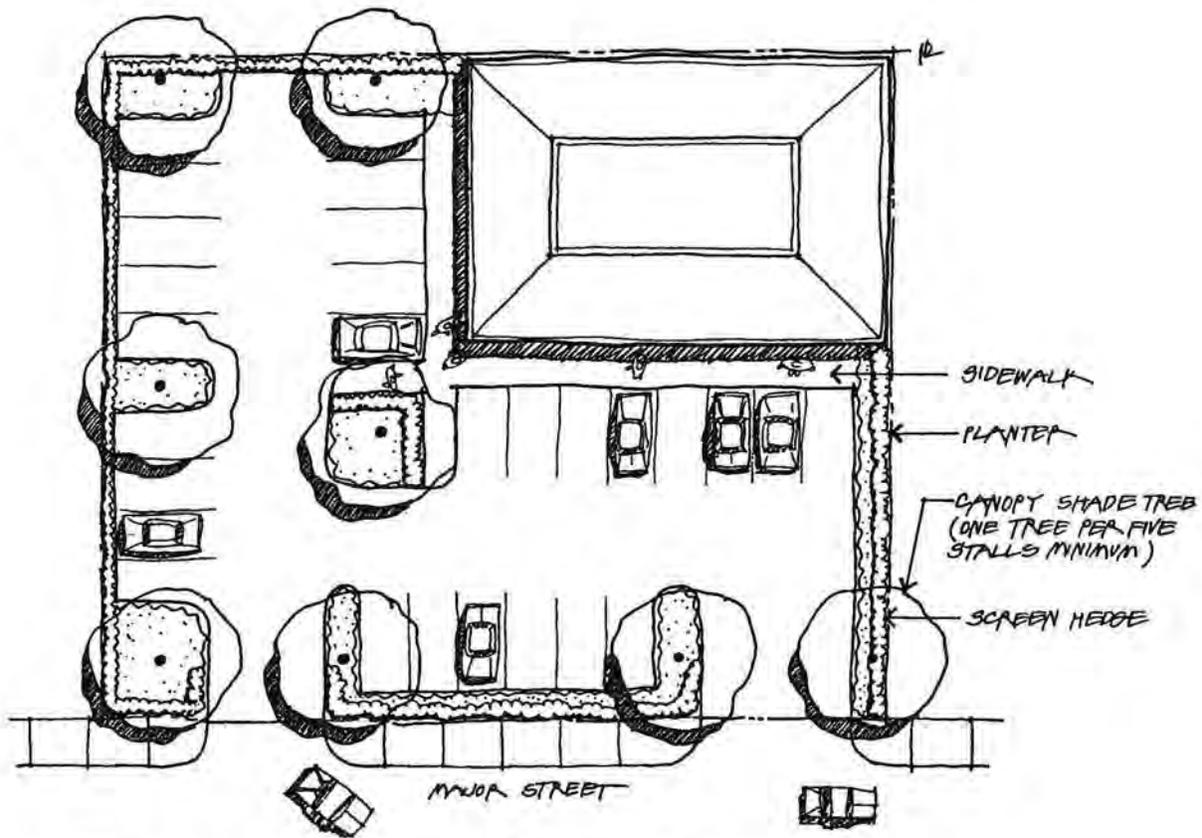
TYPICAL LANDSCAPE PLANTING PLAN—HAIKU
